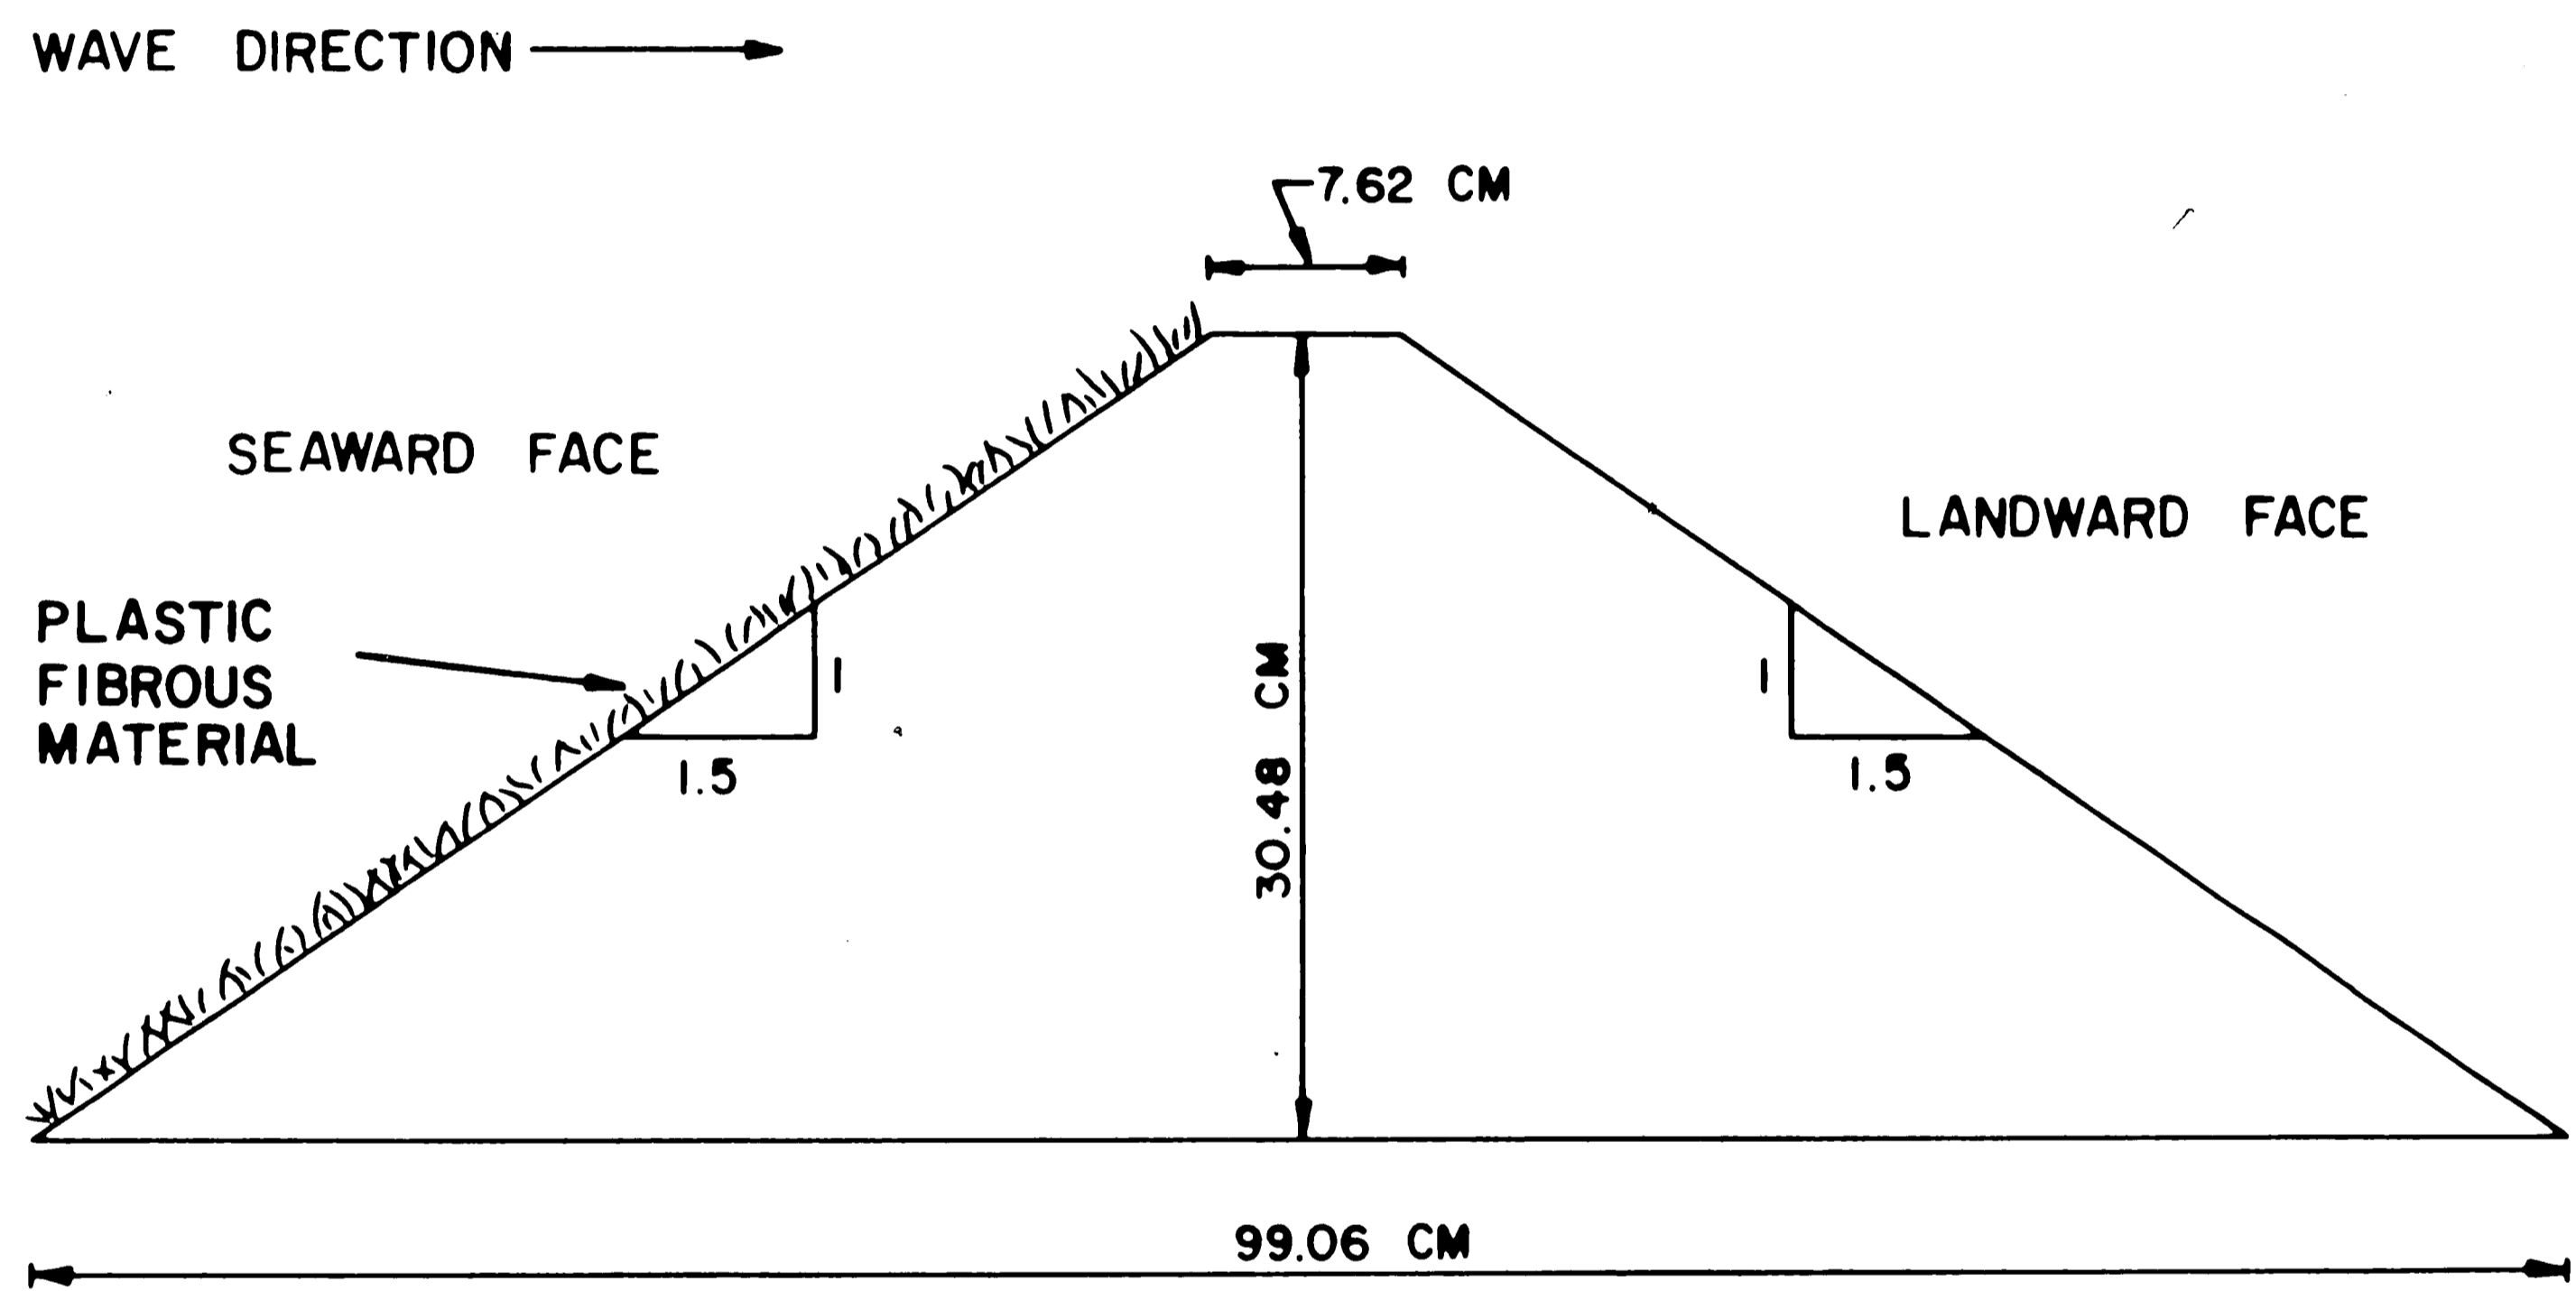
CROSS SECTION OF THE TOE STRUCTURE
